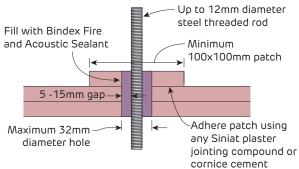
Up to 12mm steel diameter threaded rod Maintains RISF and FRL of ceiling under floor/roof systems Patch above ceiling lining Valid for 2 layers only - Section
